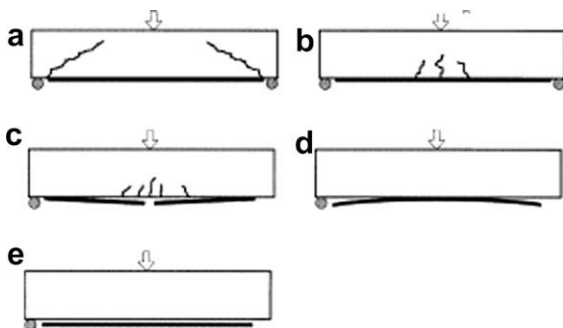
Typical failure of plate-bonded concrete structures.
